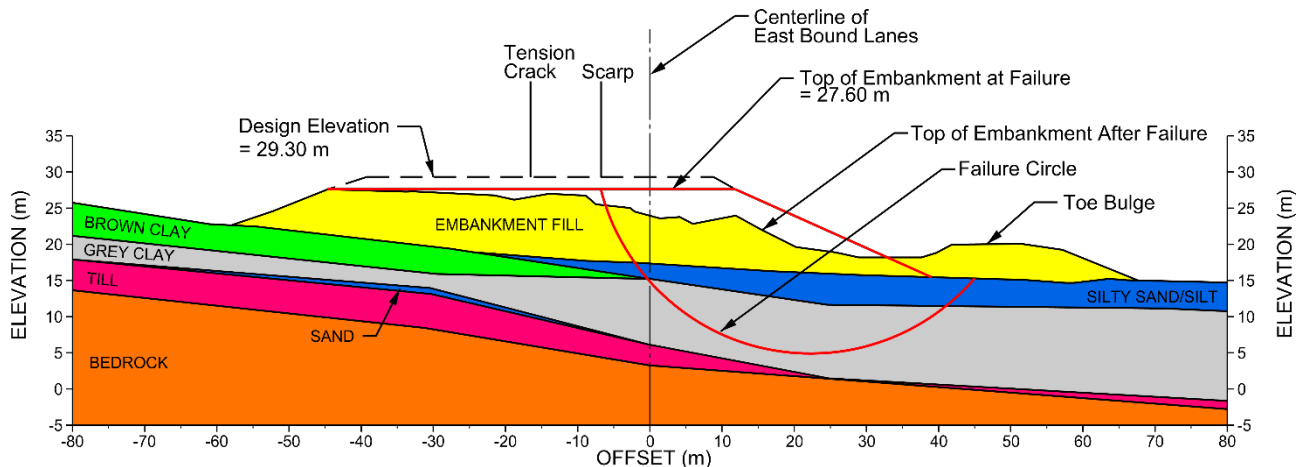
Embankment Cross Section Through Center of Original Failure
